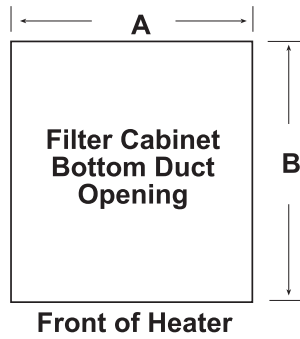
Bottom Return Air Filter Cabinet Duct Opening Dimensions (Refer to Table 10)
